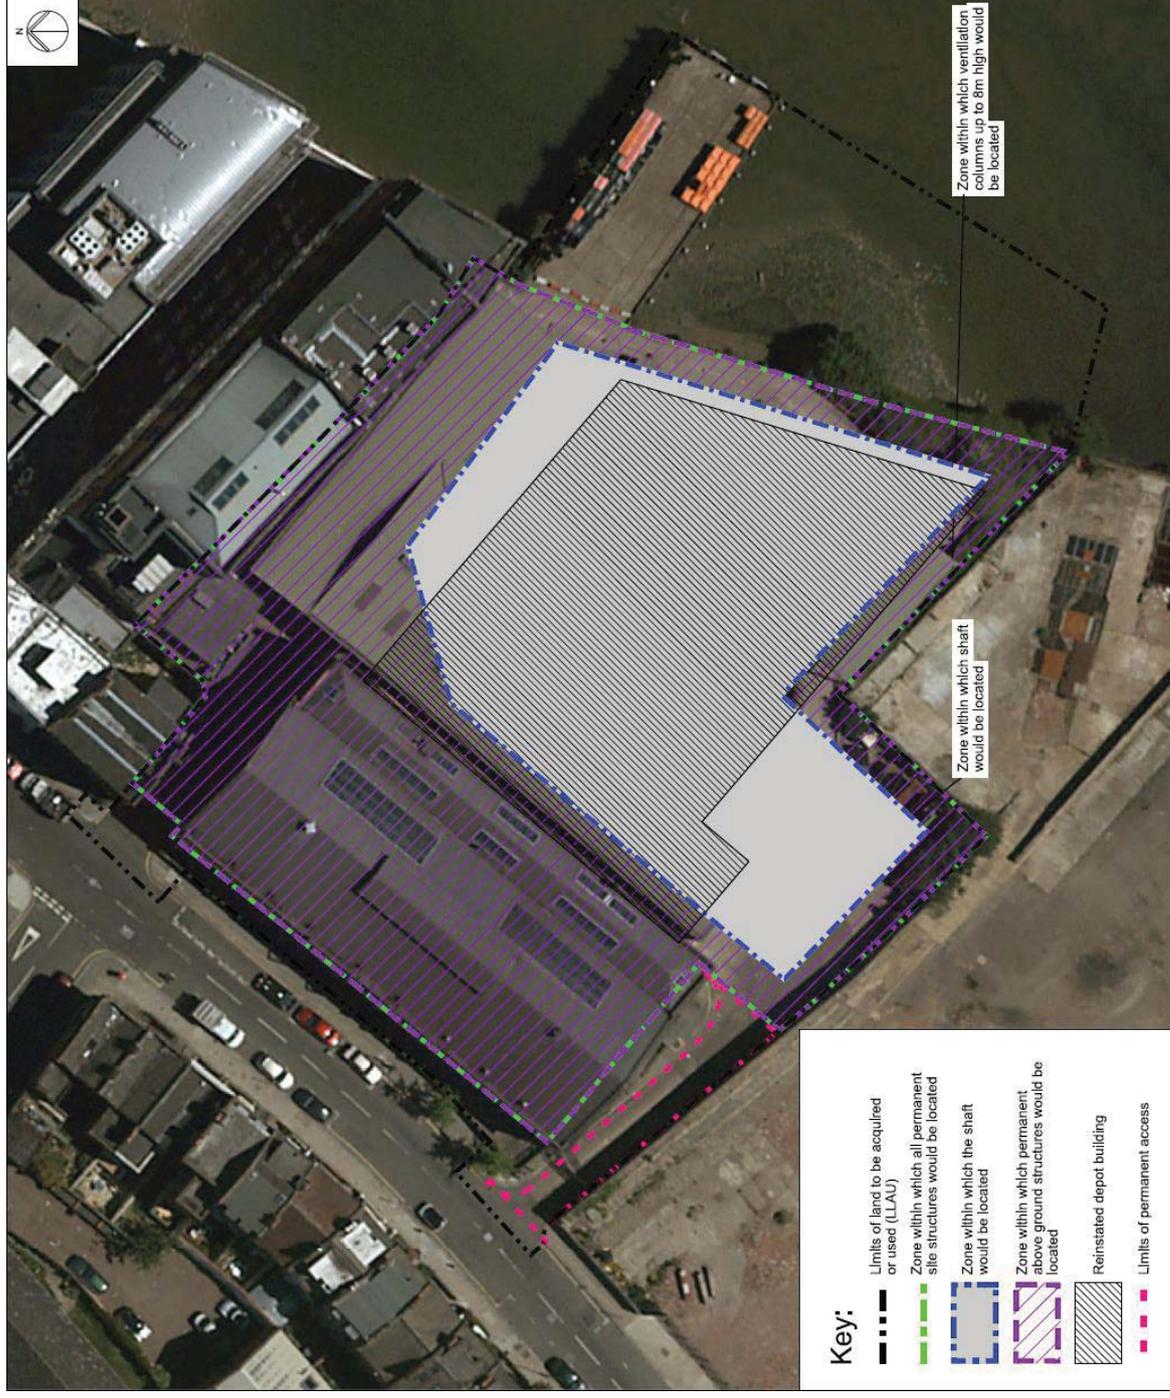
Schematic layout at the Cremorne Wharf Depot site
